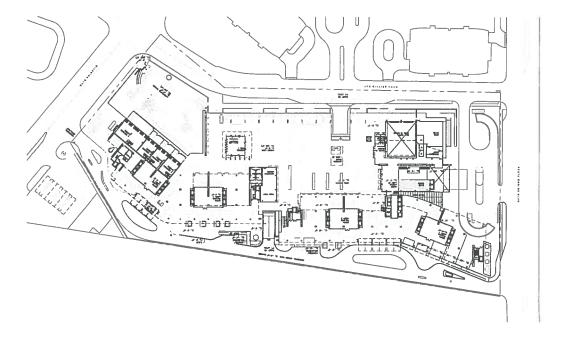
BUILDING - LEVEL 1 ONE BEVERLY HILLS
